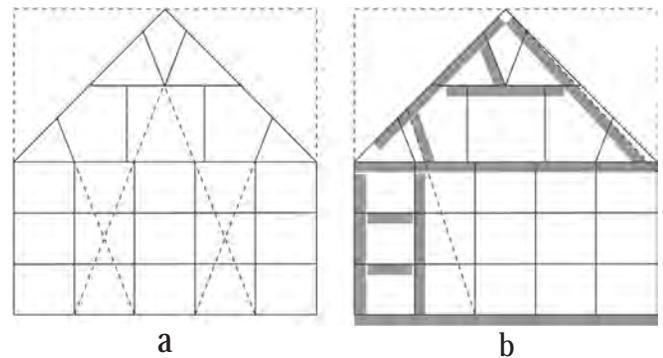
ROOF TRUSS BRACING AND TIMBER PLACEMENT.
